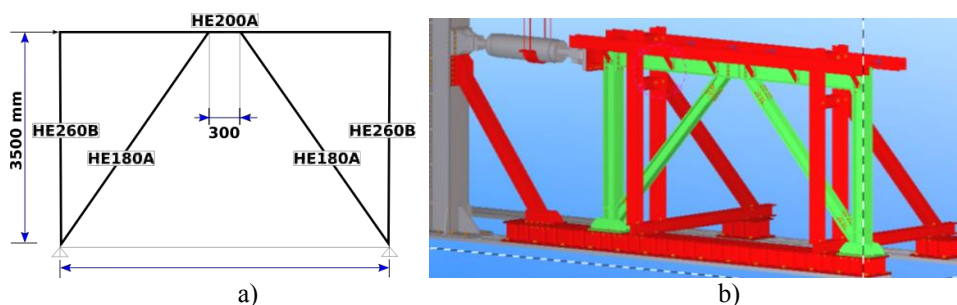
a) Dimensions of the steel EBF specimen; b) Experimental lay-out
